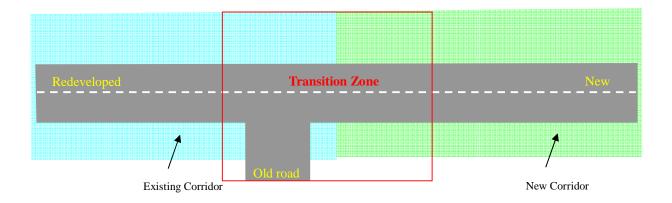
Junction between an existing upgraded (redeveloped) road and a bypass (new)
